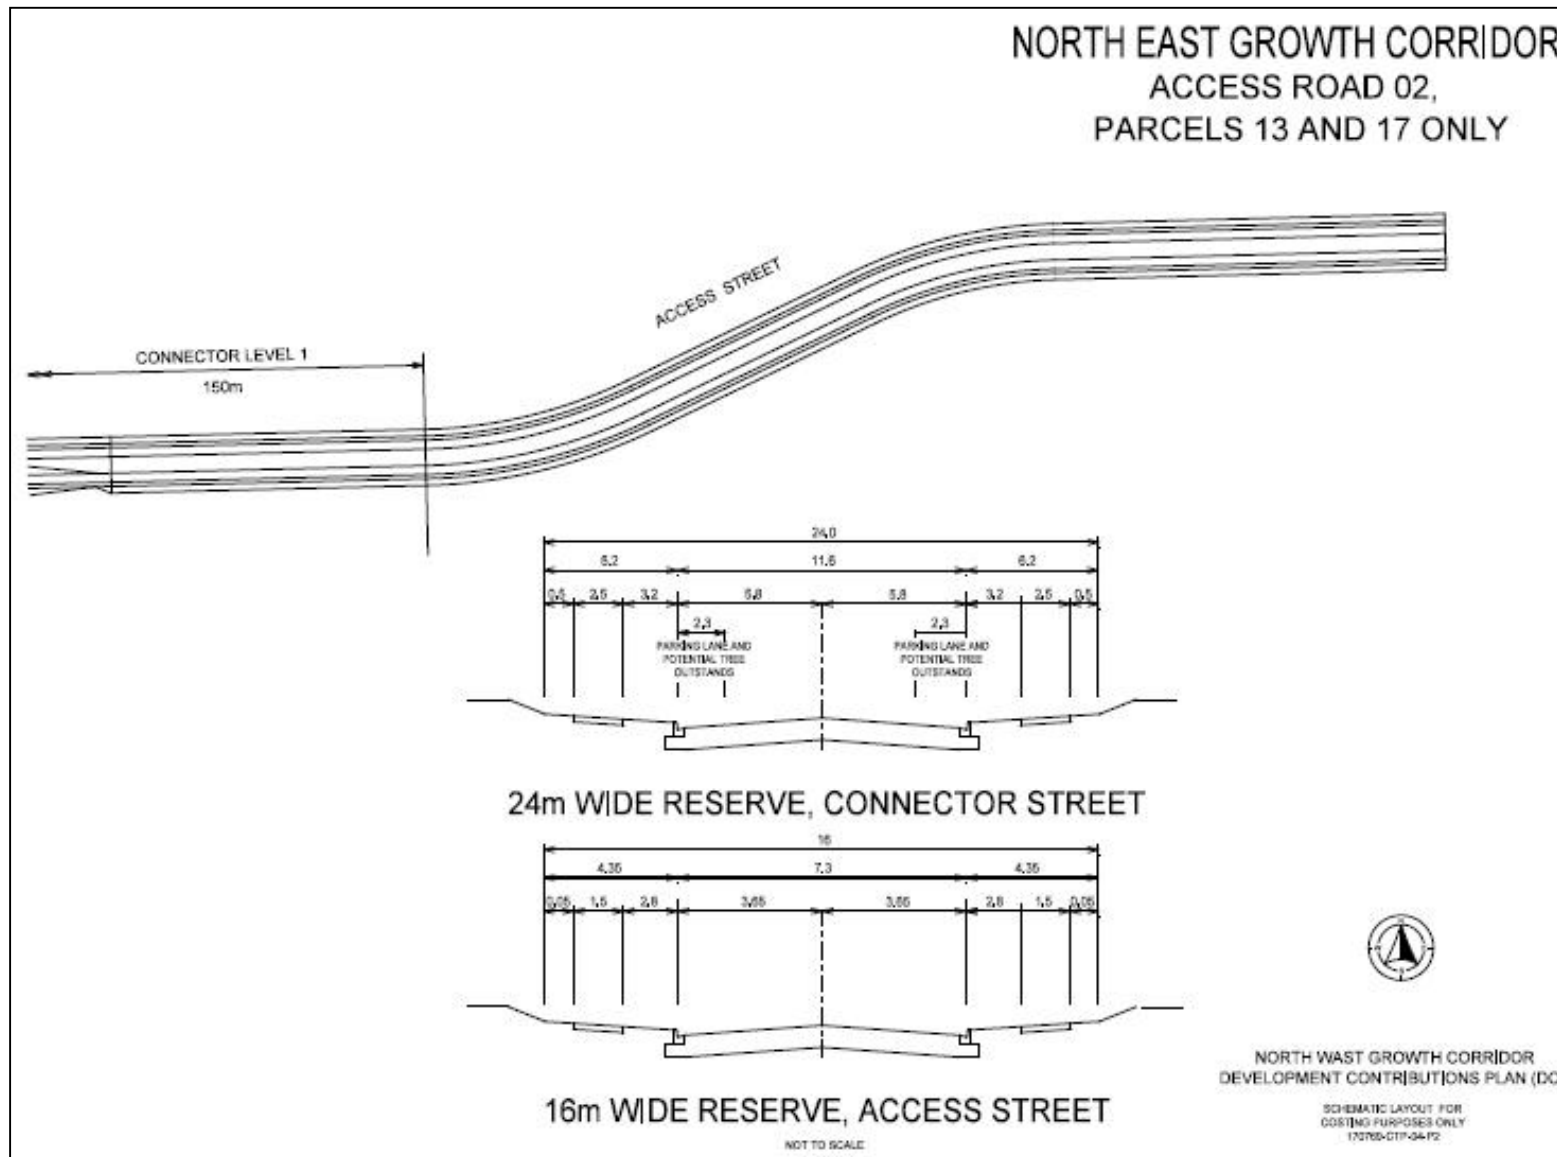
Typical Road Profile for Road-01 – Access Street to serve only Parcels 13 & 17
